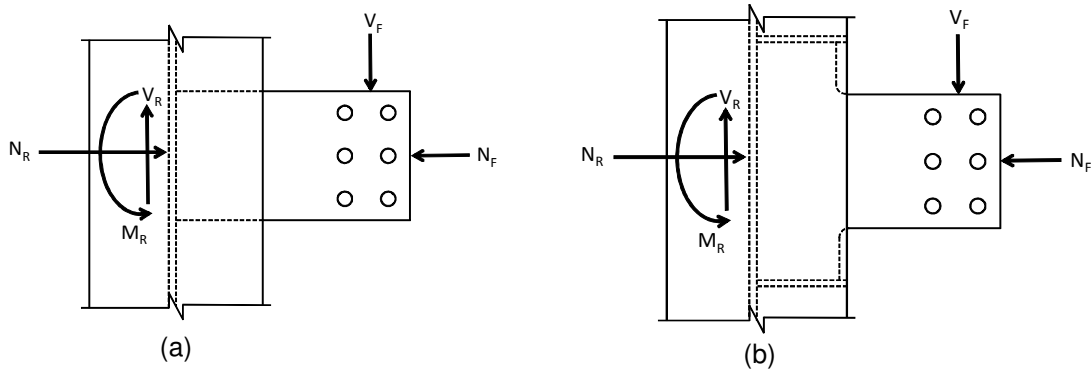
Combined loading on (a) unstiffened and (b) stiffened extended shear tabs
